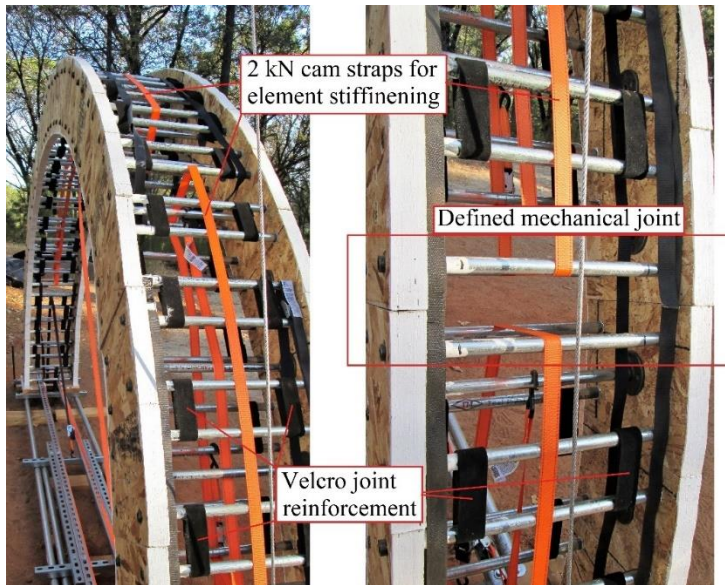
Velcro® Reinforcement, cam strap element stiffening and a defined mechanical joint for the full-scale arch
